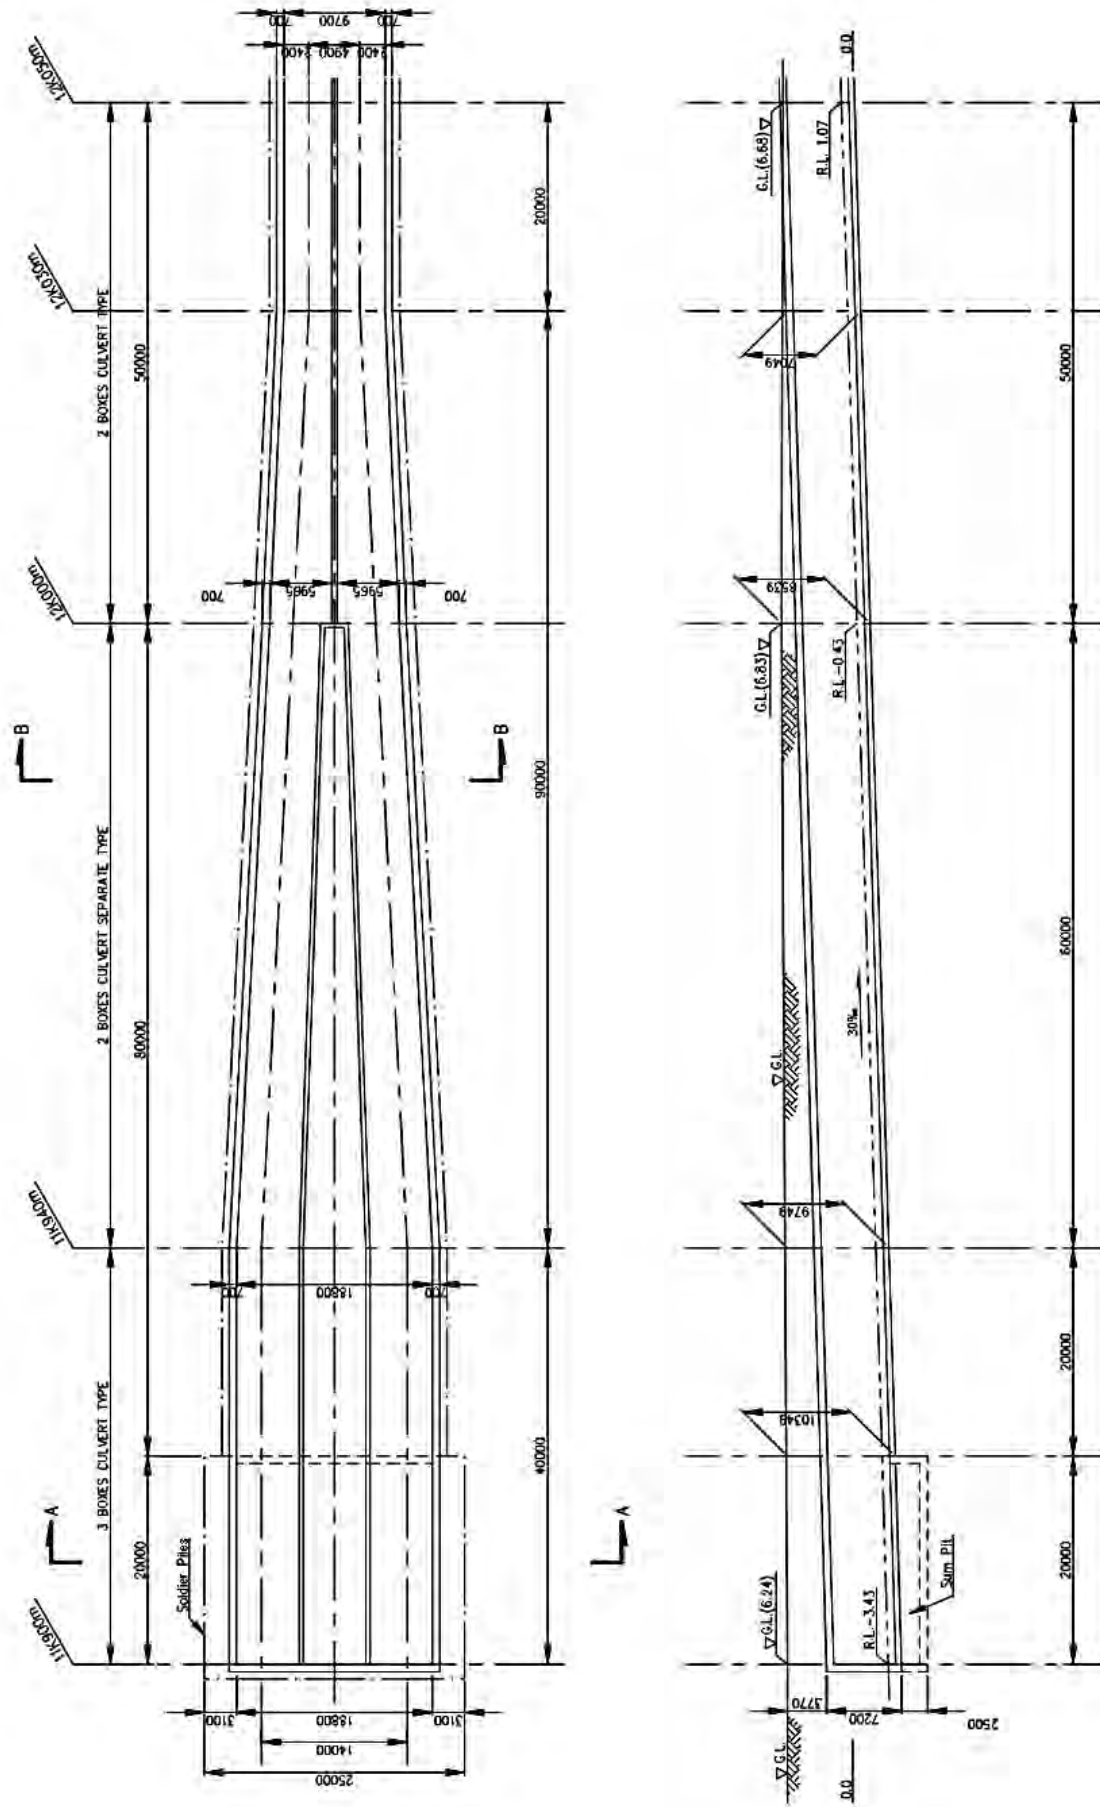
Plan and Profile at Transition Between Future Park Station - Bashundhara Station (1)
